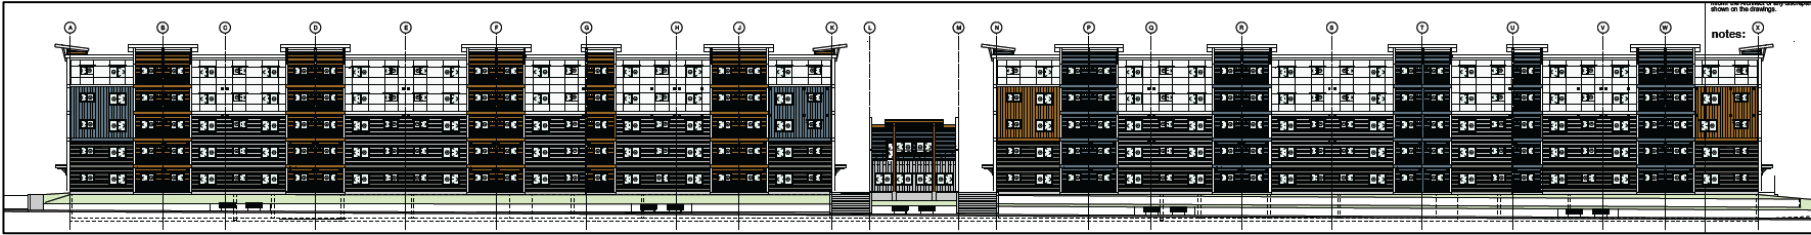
West Elevation of Proposed Buildings (Facing South Main St)
